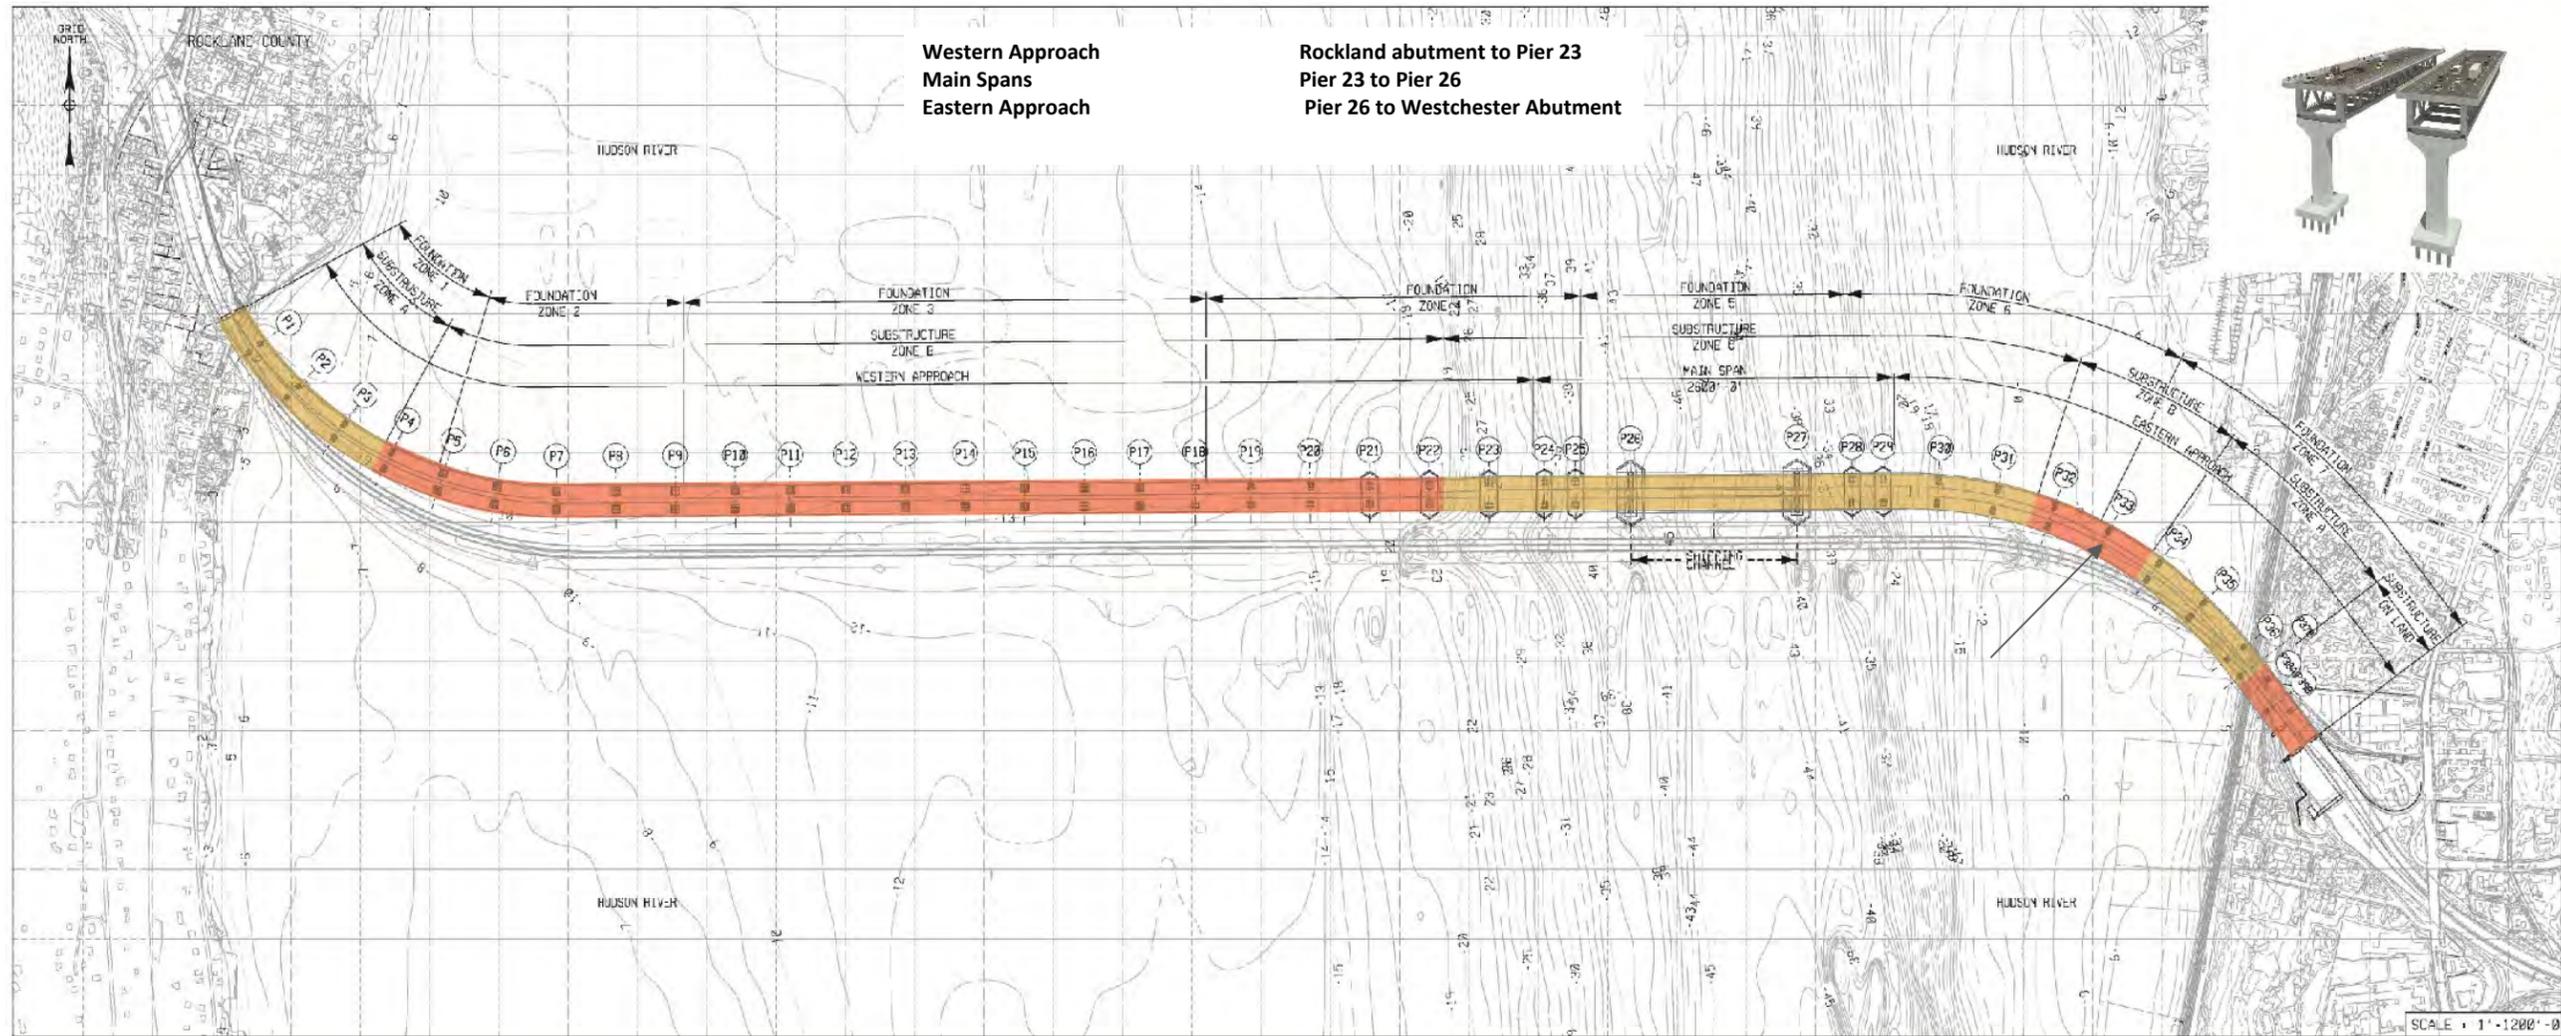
Long Span Bridge Option – Indicative Plan and Elevation
